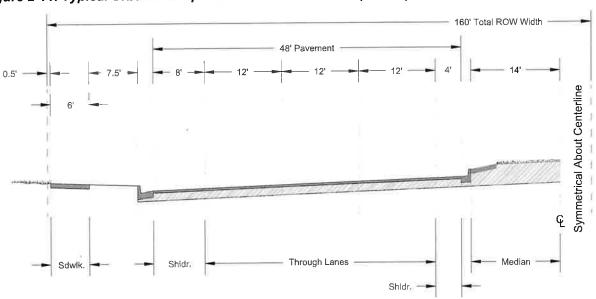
Typical Urban Principal Arterial Cross Section (6 Lane)
